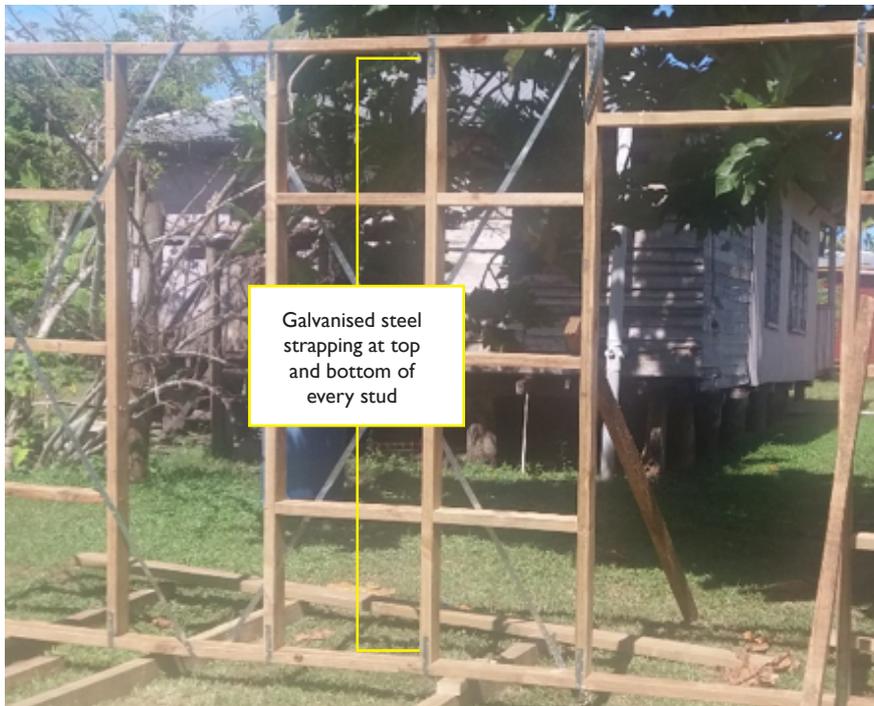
Stud wall frame with galvanised steel cyclone strapping (Source: Fiji Rural Housing Unit)
